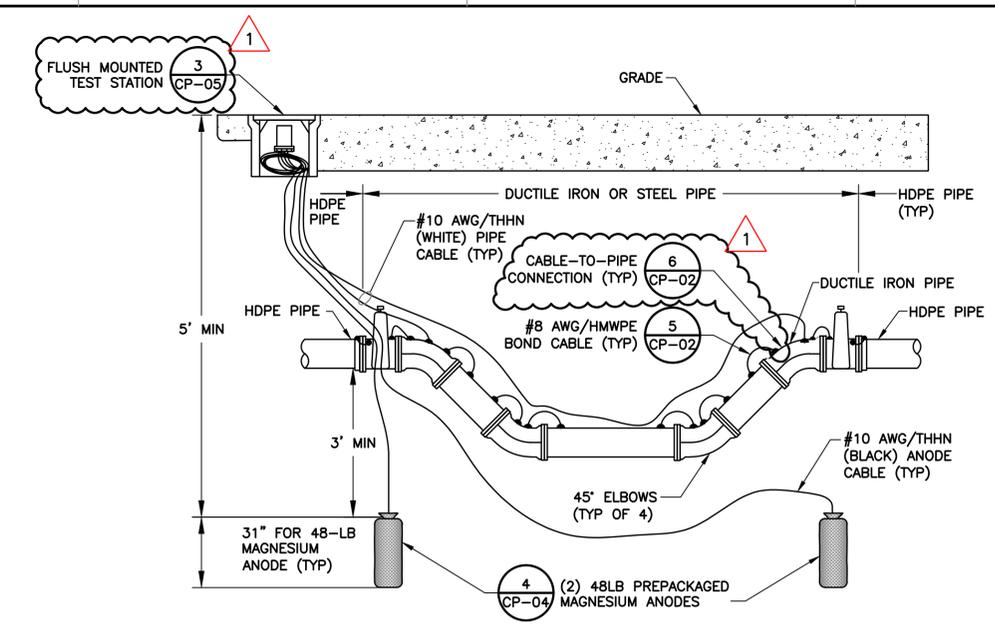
FITTING - ANODE & TEST STATION
